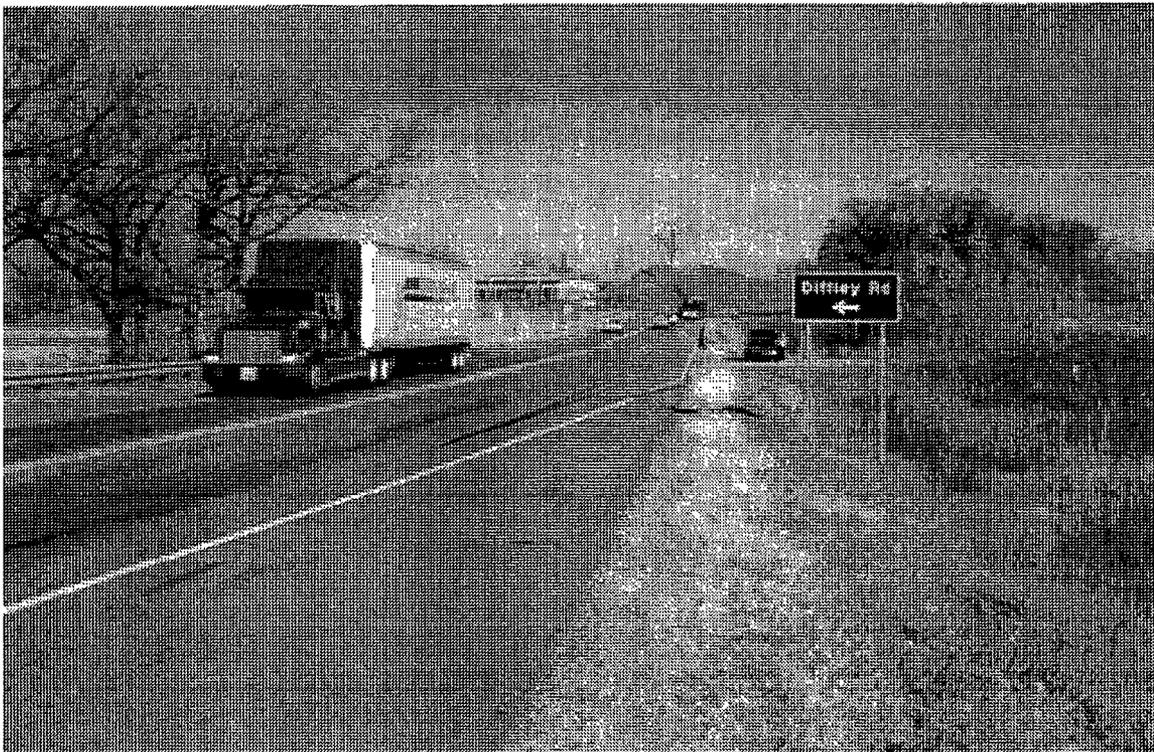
Photograph of a T-intersection site with a short bypass lane.
